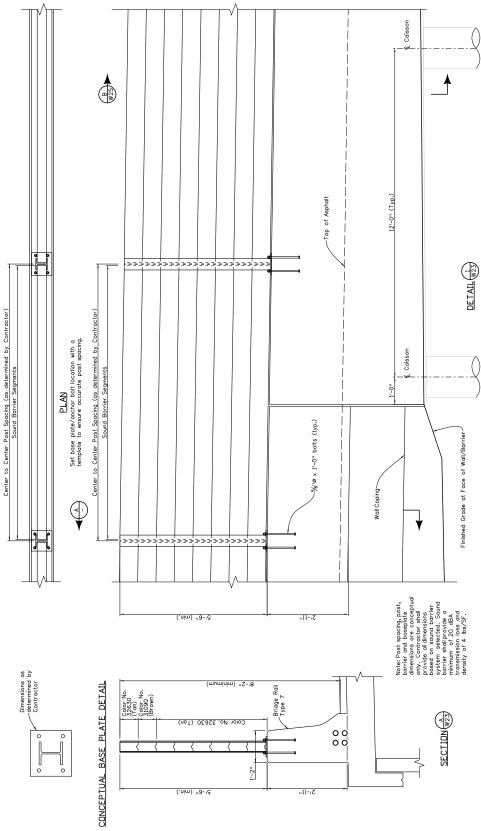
Sound Barrier on Bridge Example
